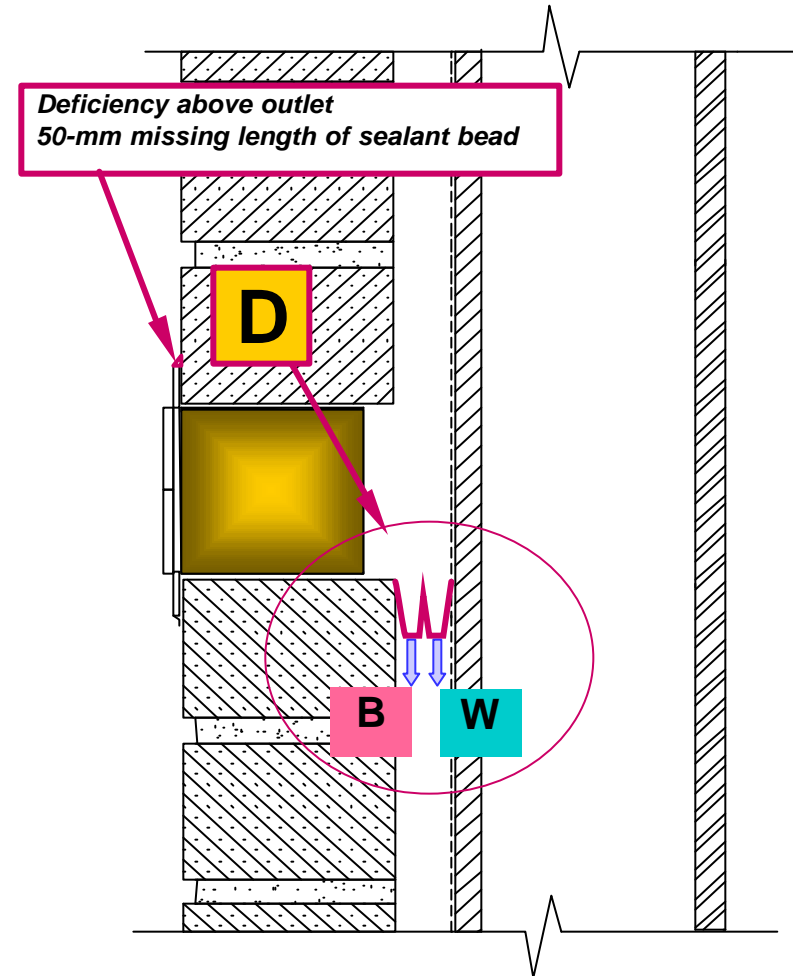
Location of water collection points and troughs in ventilation–drainage space between brick cladding and sheathing.
